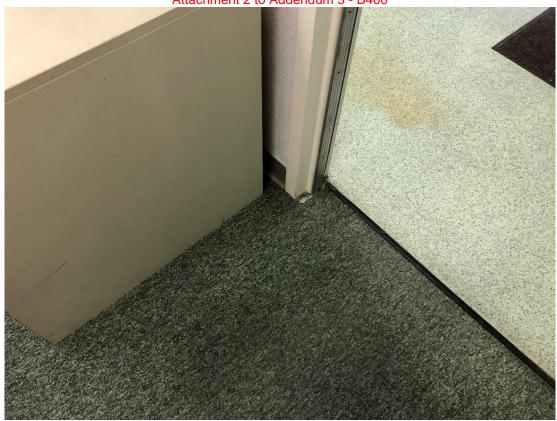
Building 400 / Room 405, Carpet Adhesive
